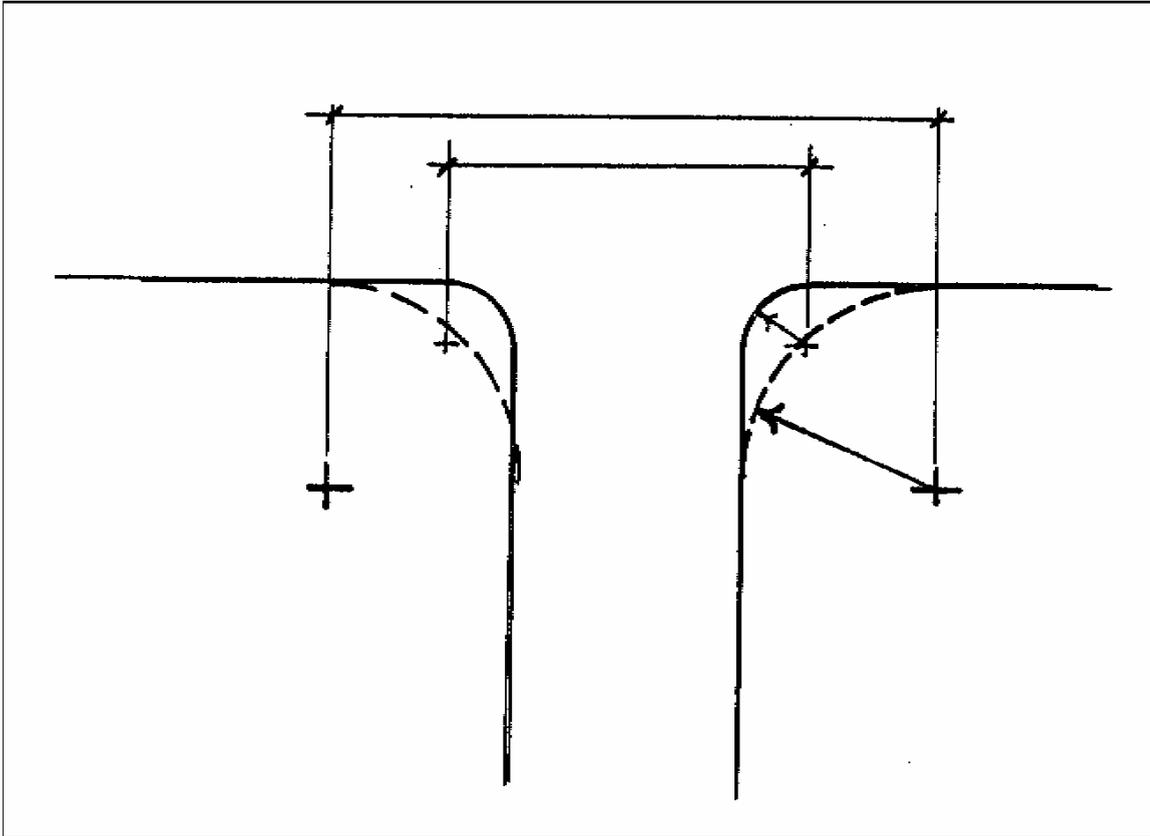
Plan-view diagram of a street intersection. Reducing the radius of street corners slows turning vehicle traffic and shortens pedestrian crosswalks. It should be noted all plans are subject to review and approval of the Milton Fire Department.
